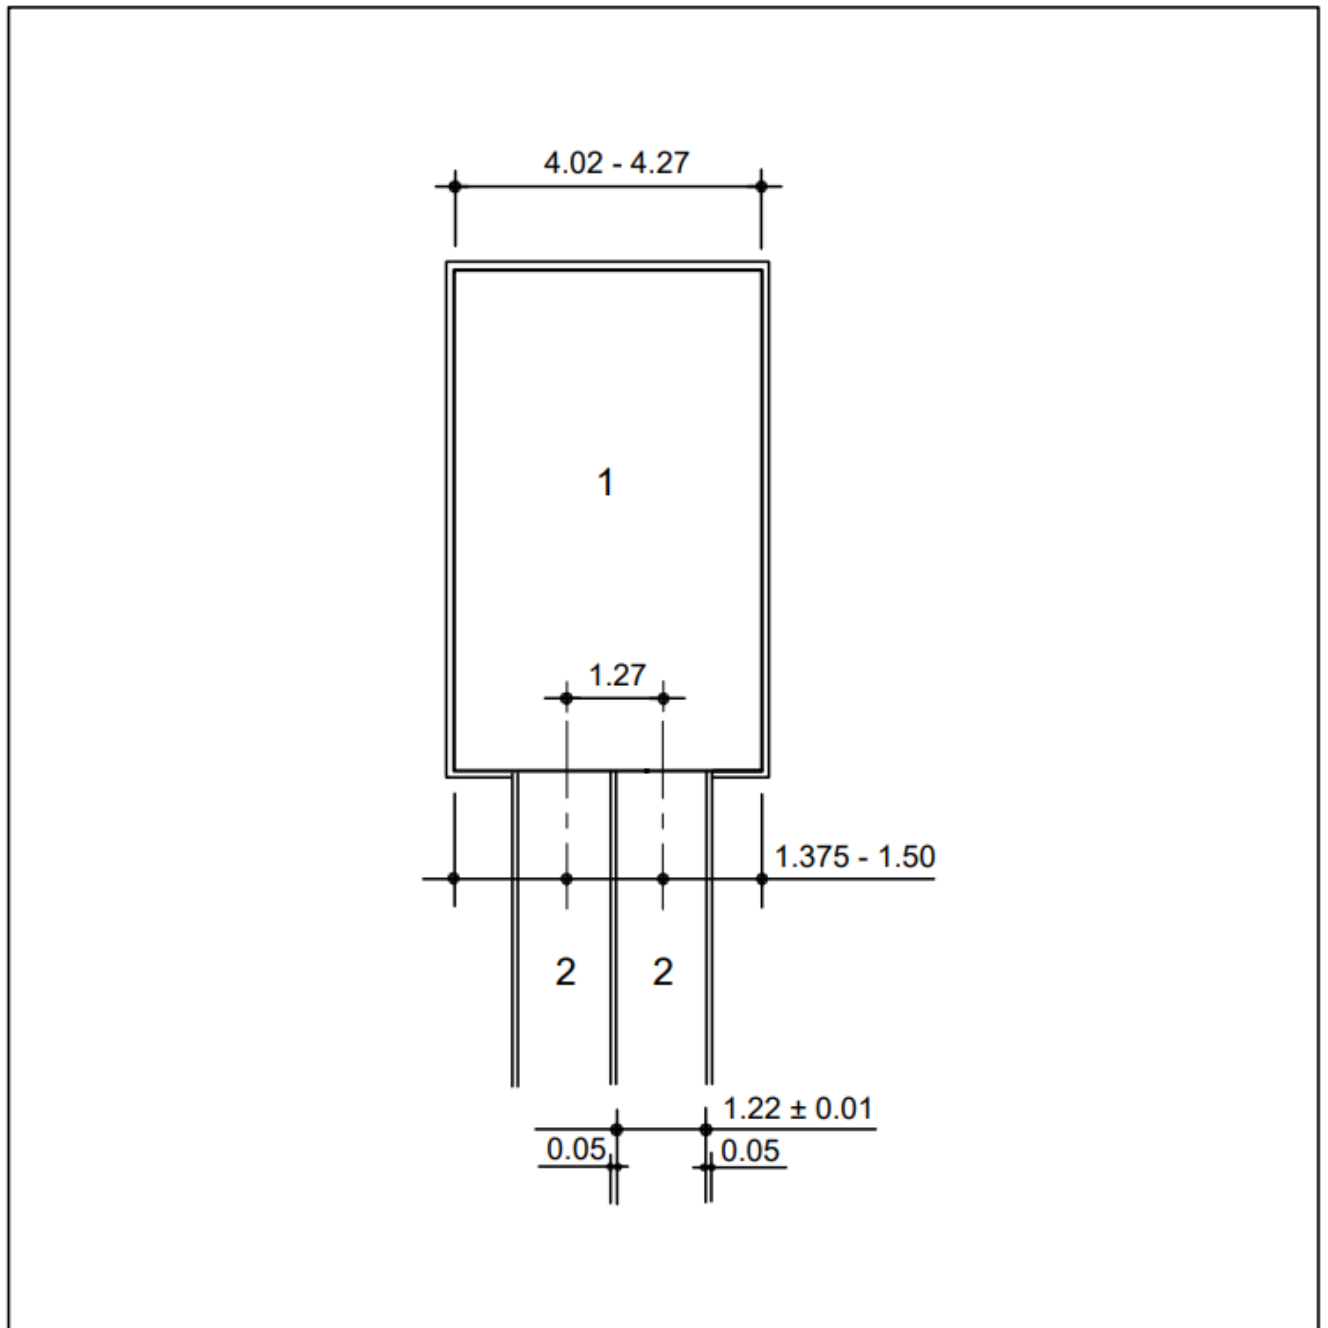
Two-runway Long and Triple Jump landing area (Dimensions in m)
